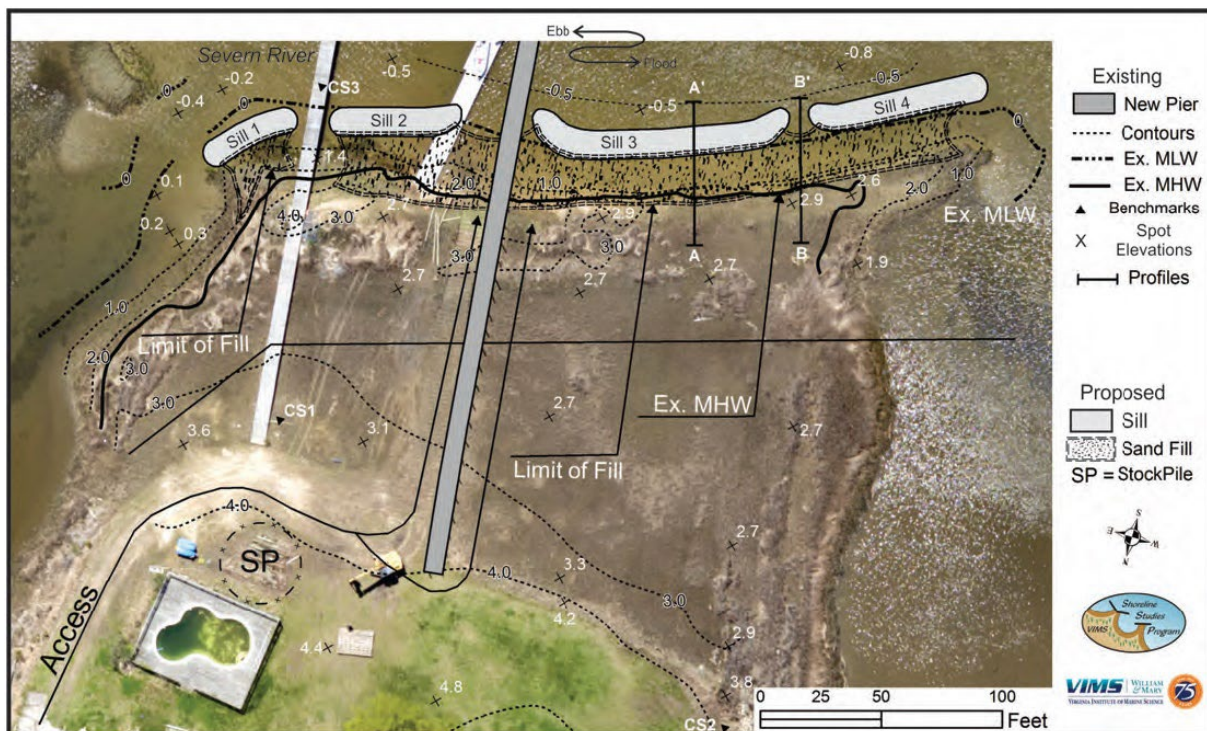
Living shoreline design site plan layout (Milligan et al., 2016)
